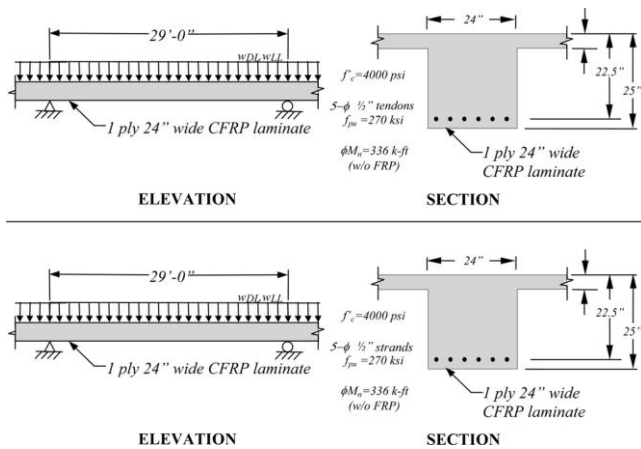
Schematic of the idealized continuous prestressed beam with FRP external reinforcement.
